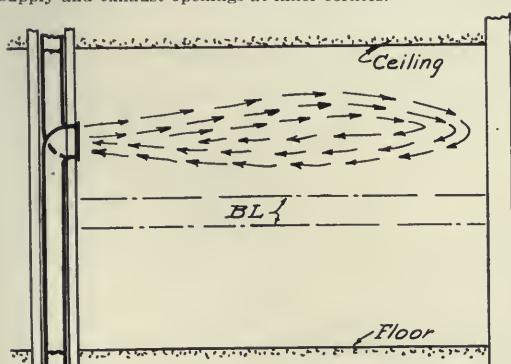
Section of classroom showing effect of locating both supply and exhaust openings above breathing line.
